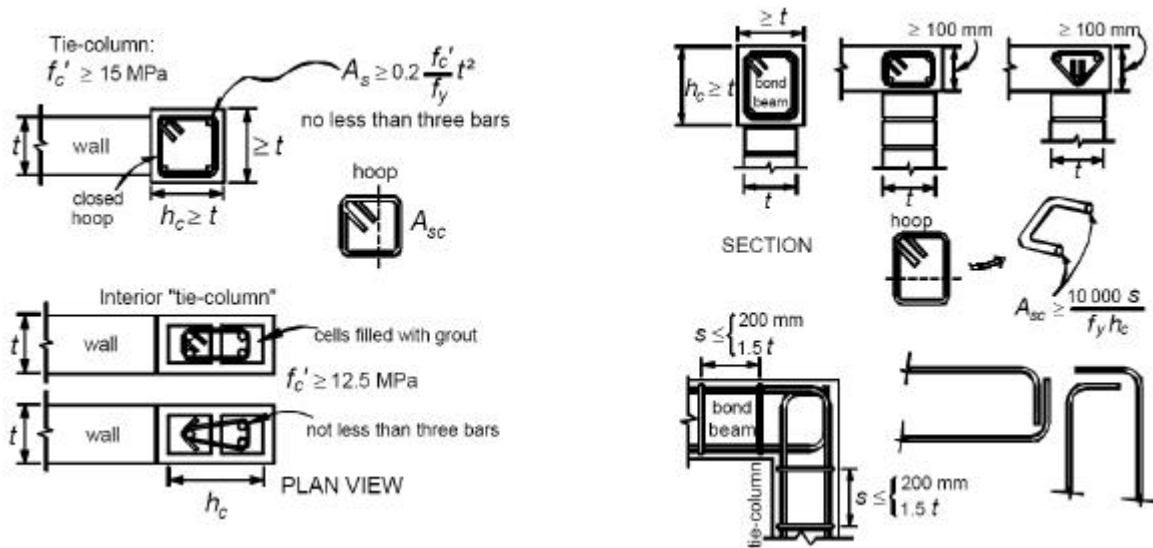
Detailing Requirements for Bond Beams and Tie Columns
